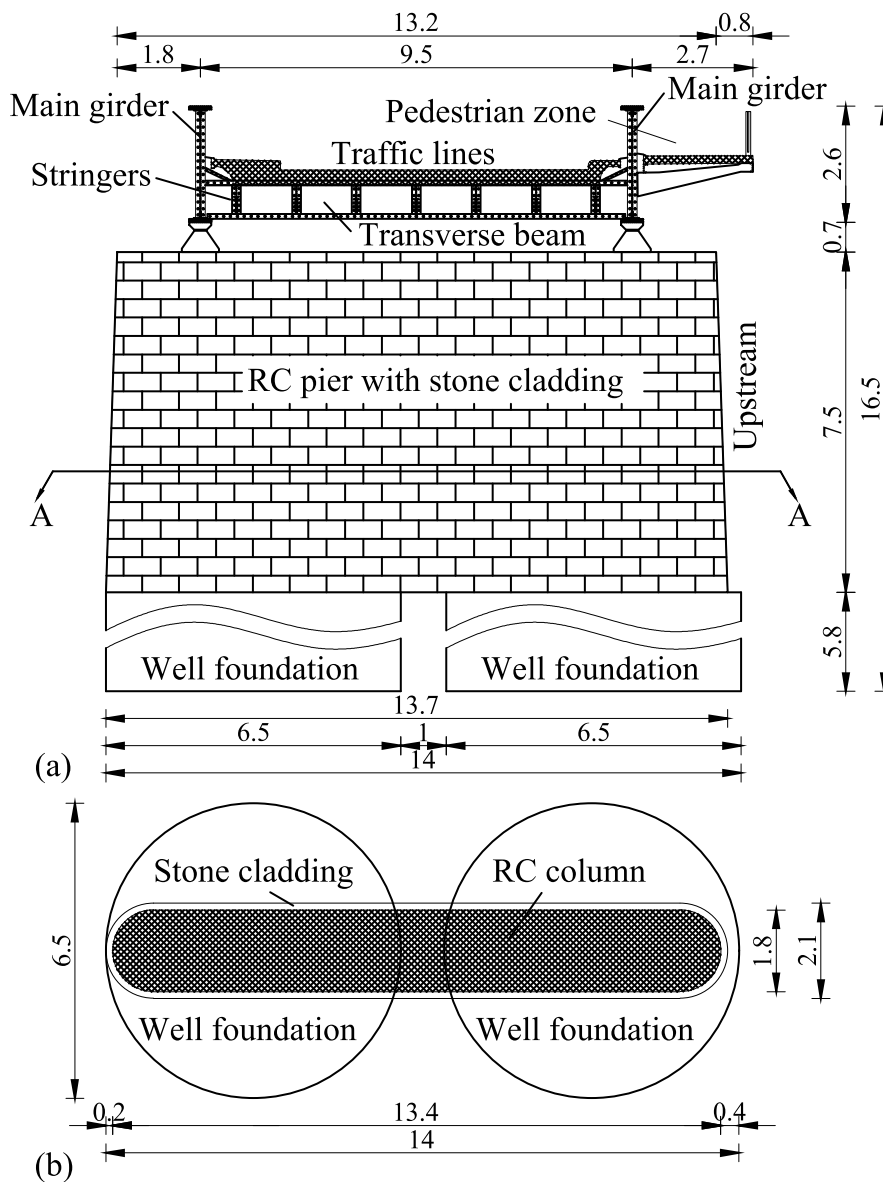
(a) Cross-section of the modelled bridge in the first span, (b) Section A-A at the base of the pier.
